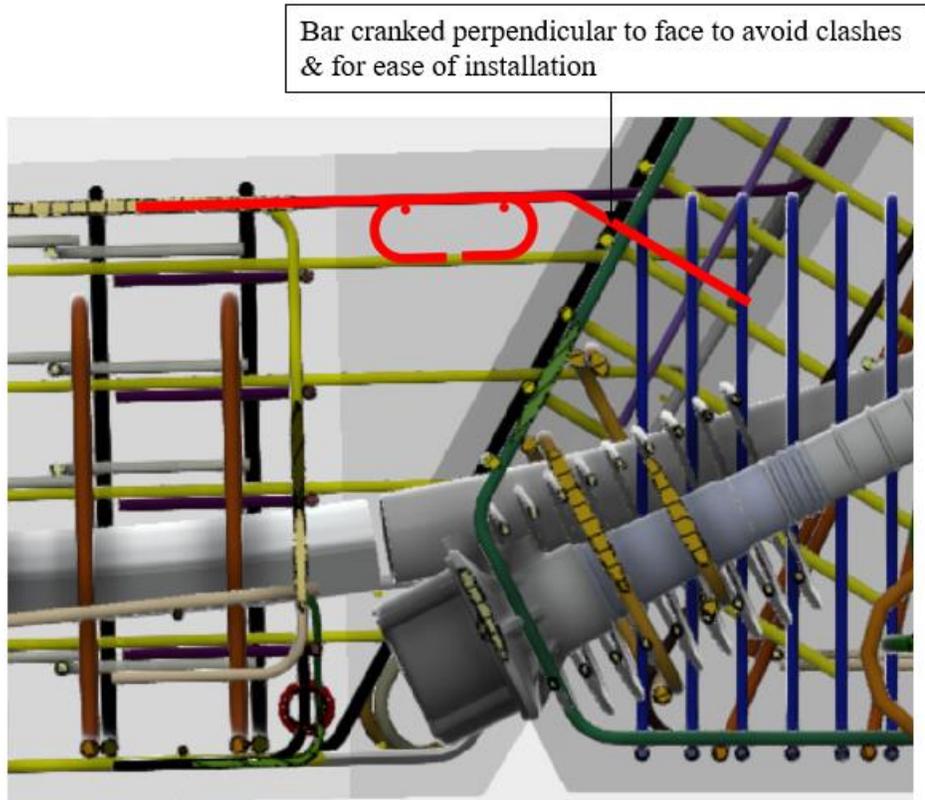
Proposed reinforcement layout. New reinforcement shown in red, all other reinforcement is existing.
